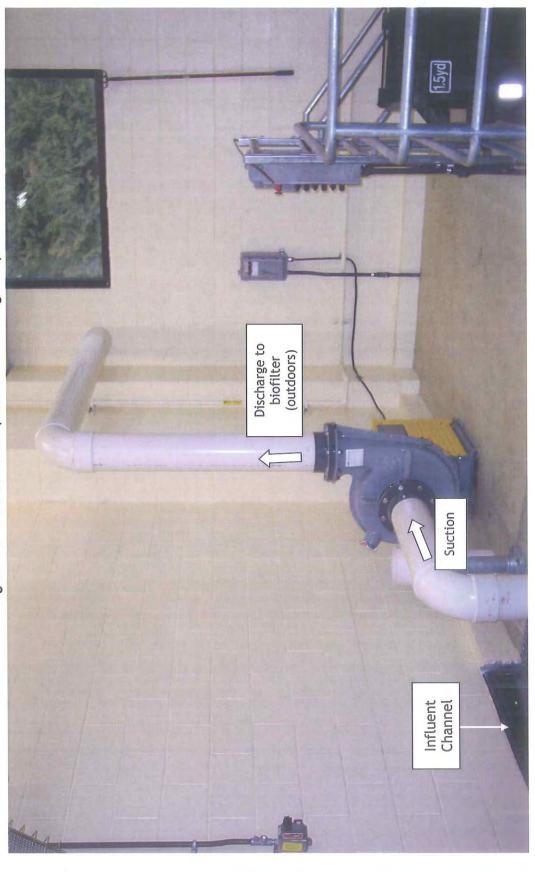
Biofilter Blower (Headworks Building No. 1)
